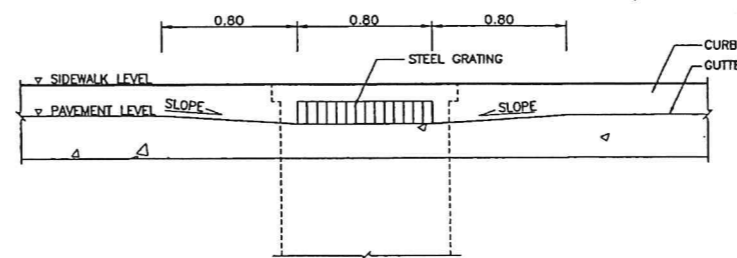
DETAIL OF CURB AND GUTTER OR CURB AT RAISED MEDIAN
